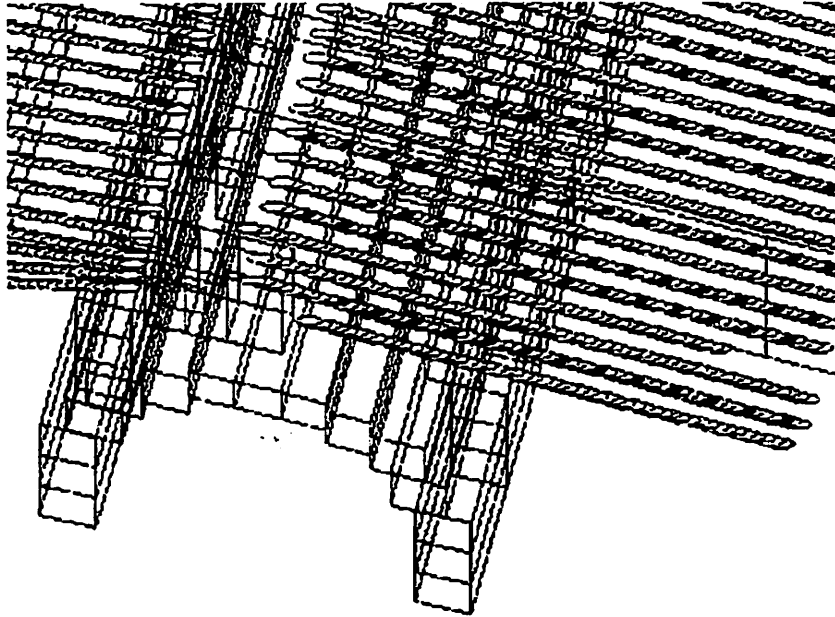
Schematic Location of Grout Pipes Over the Rio Piedras Station
